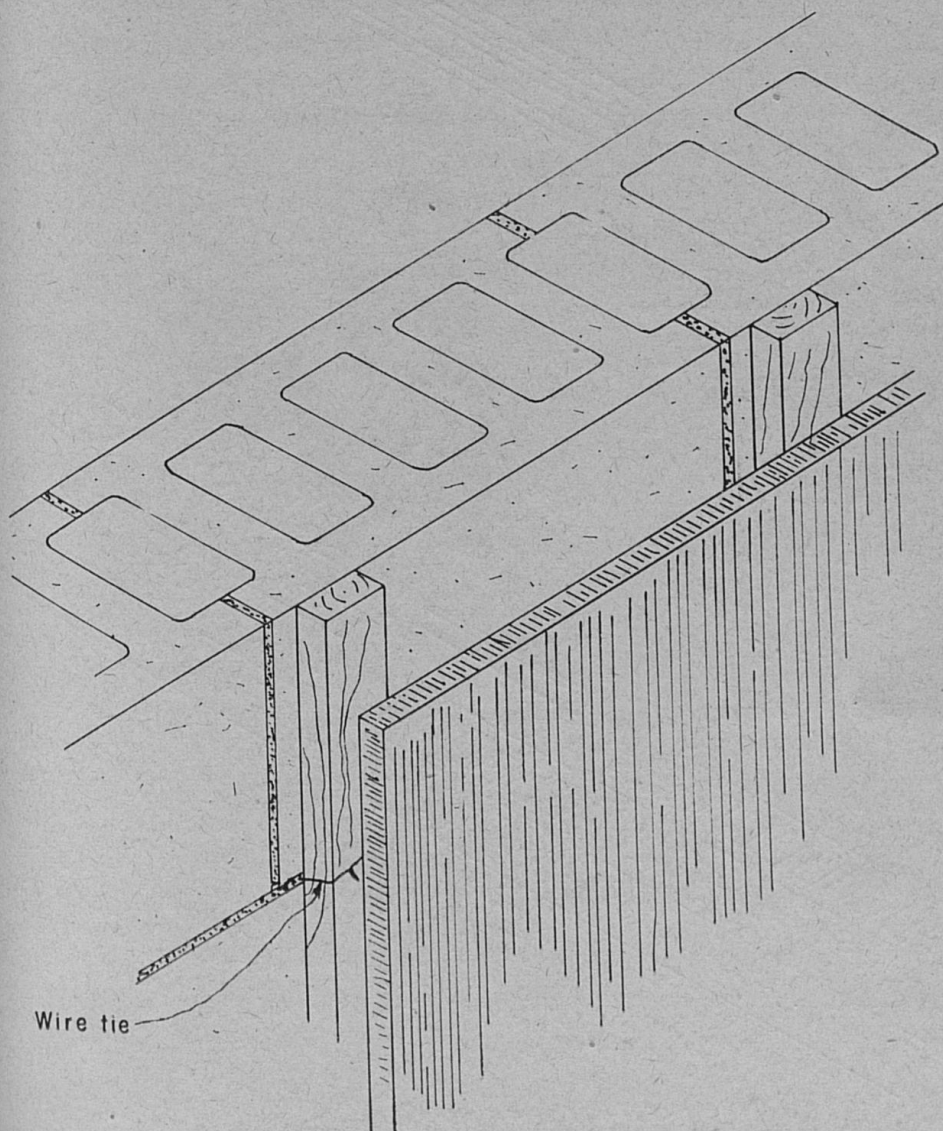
Adding insulation board. The furring strips are held in place by wire laid in the mortar. Insulation board is to be nailed to furring strips.
